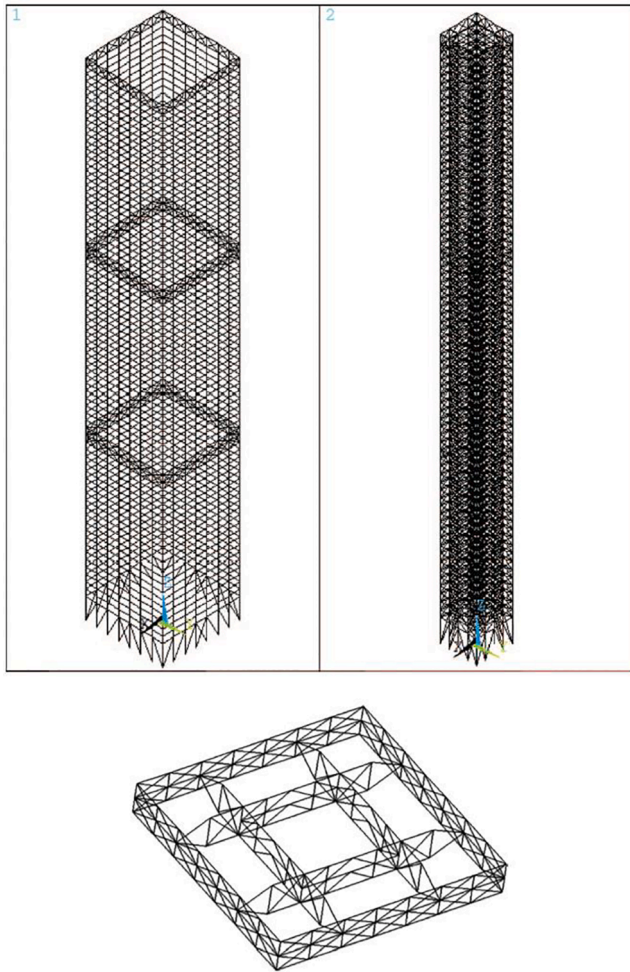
FE model of the structure. Top: external frame and core; bottom: outrigger trusses.
